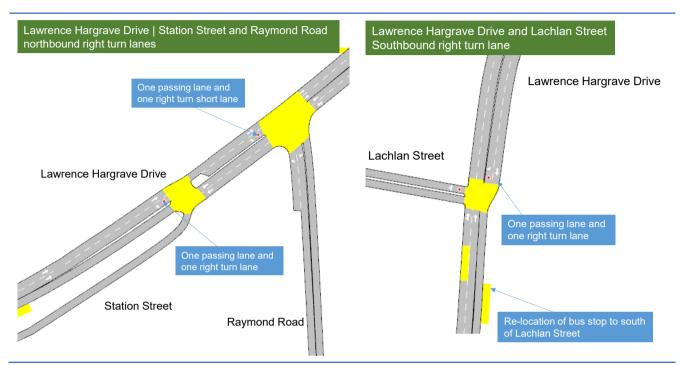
S-lanes at Lachlan Street, Station Street and Raymond Road intersection
